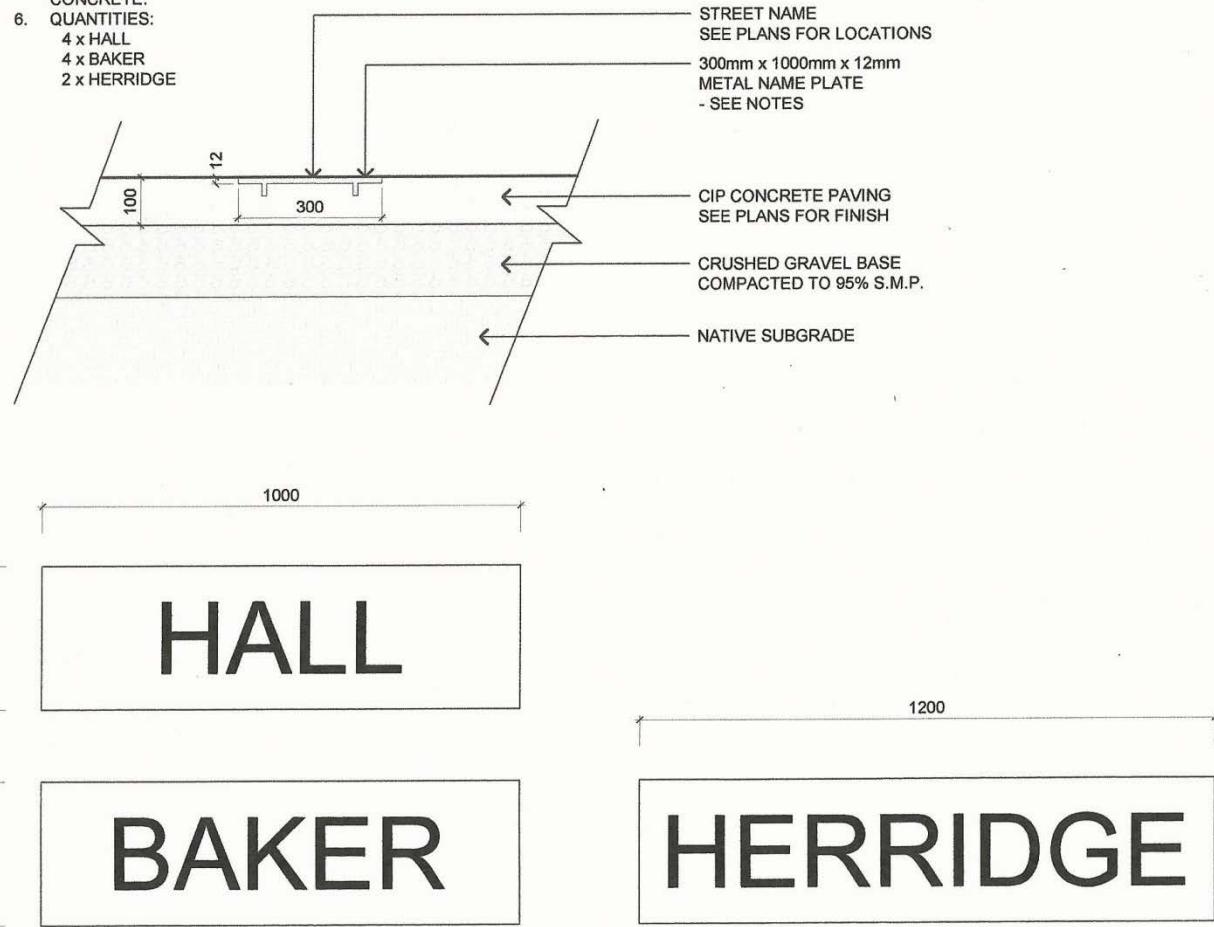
Hall Street design plan for street name insets (MMM Group, 2015)
